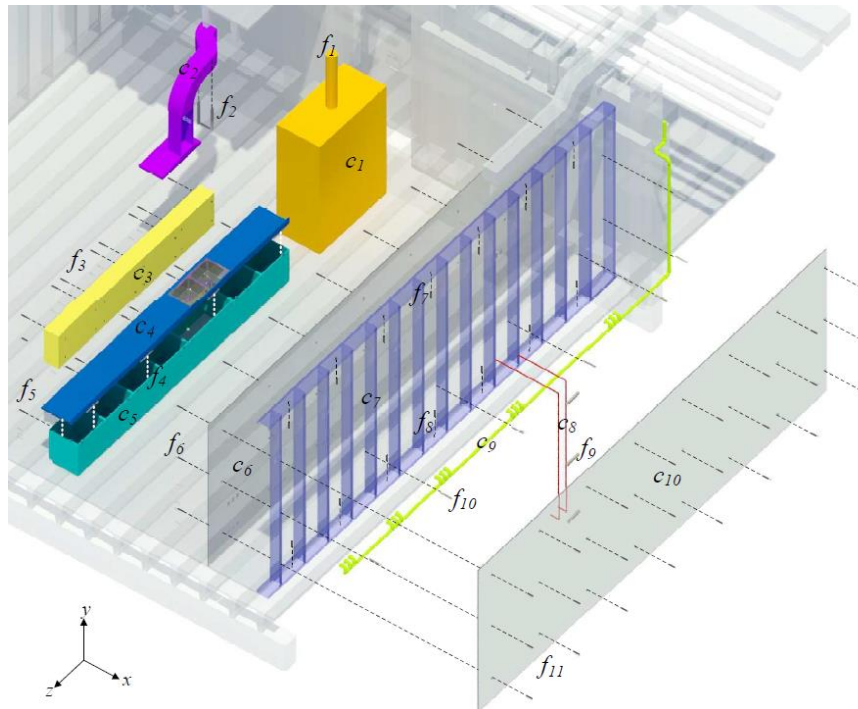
Exploded view of the disassembly model: Cluster 1
